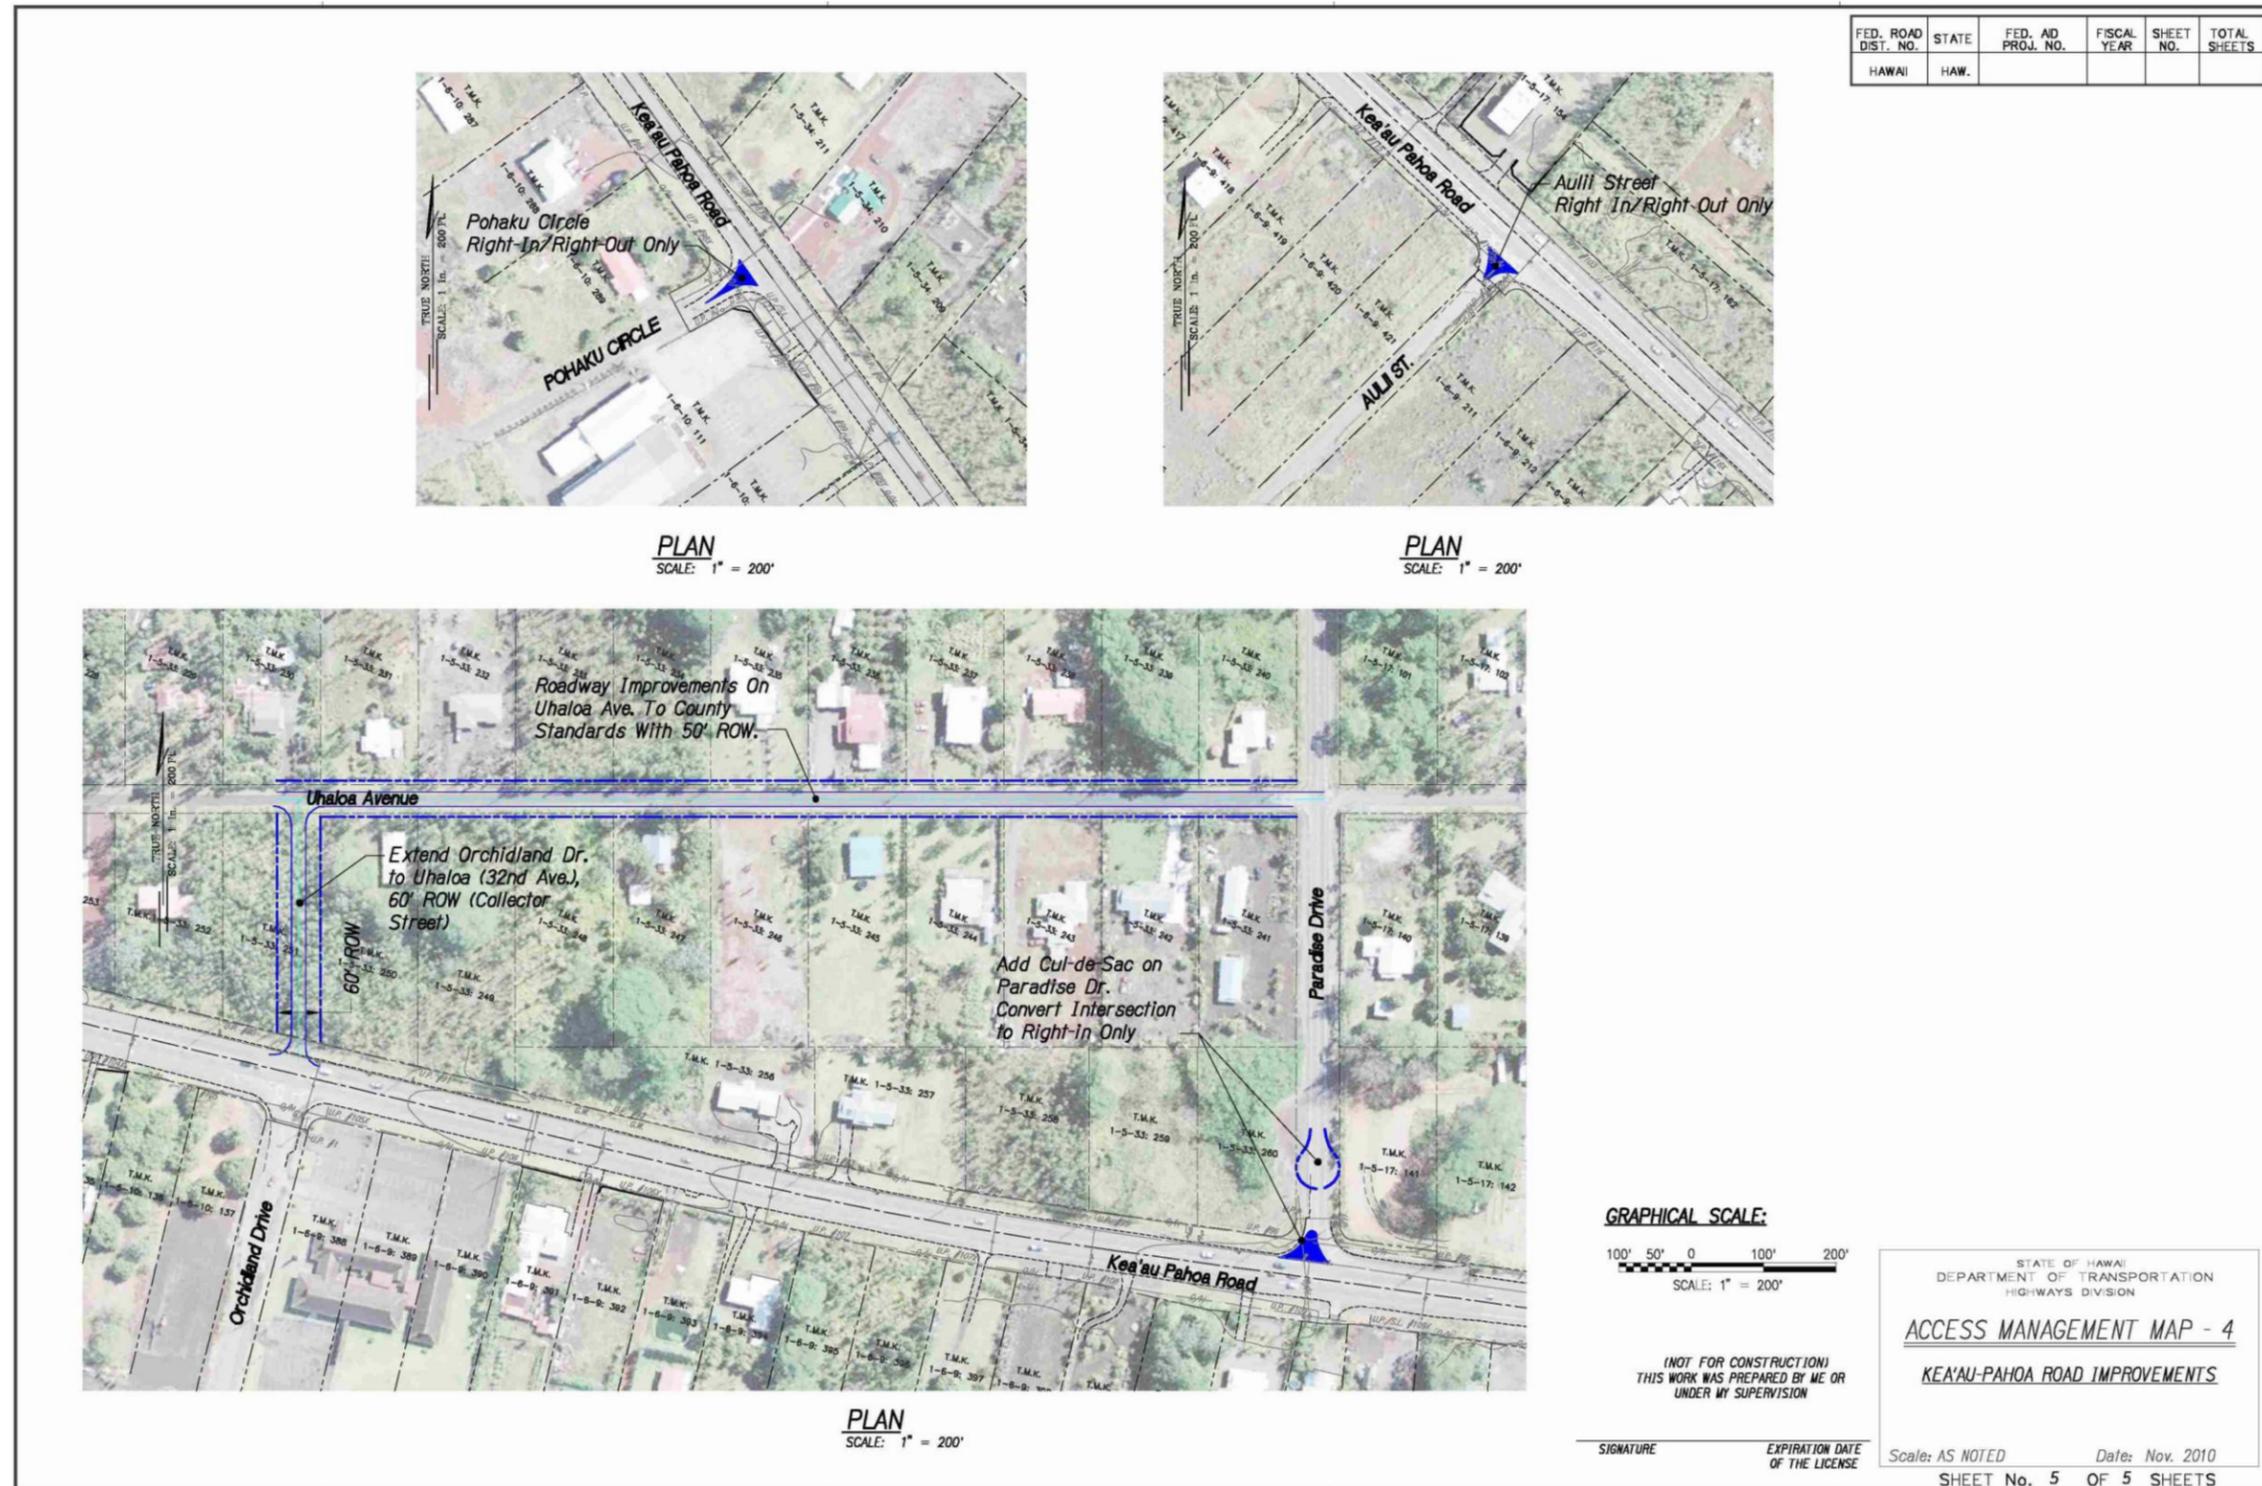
Client provided map, detailing the proposed Orchardland Drive extension and the improvements to Uhaloa Avenue
